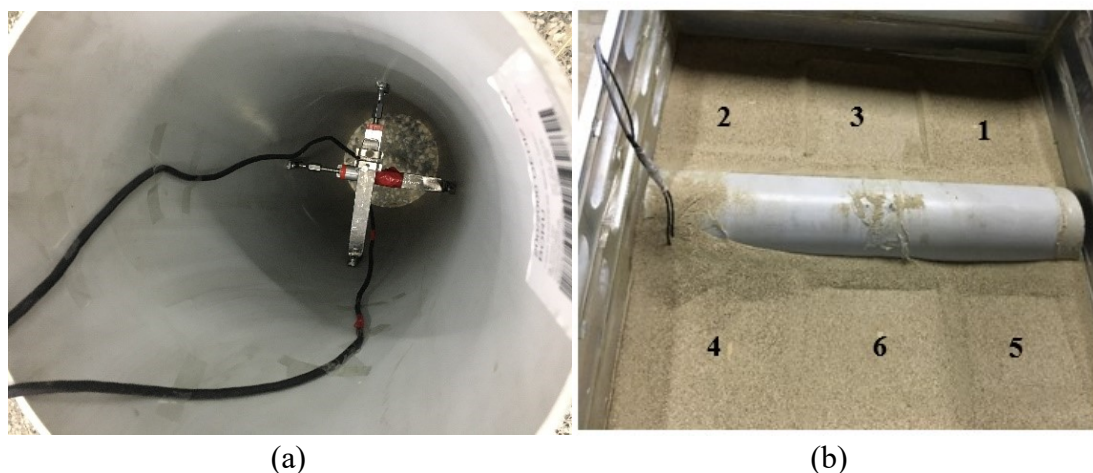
(a) Potentiometers installed inside the pipe, (b) Compaction of soil in six zones around pipe
